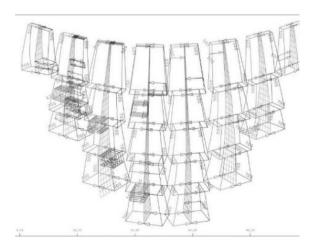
Grouting load, applied along surface of both sides of the dam joint
